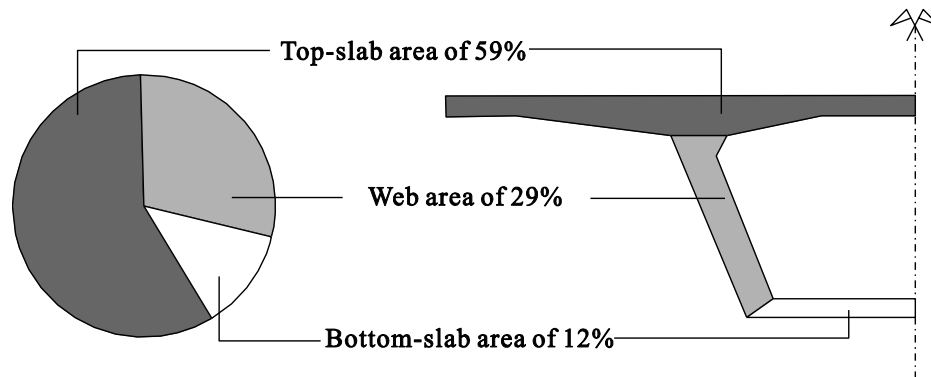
Area ratio of cross-section components of a typical hollow box girder with external tendons (from the cross-section of the SES)
